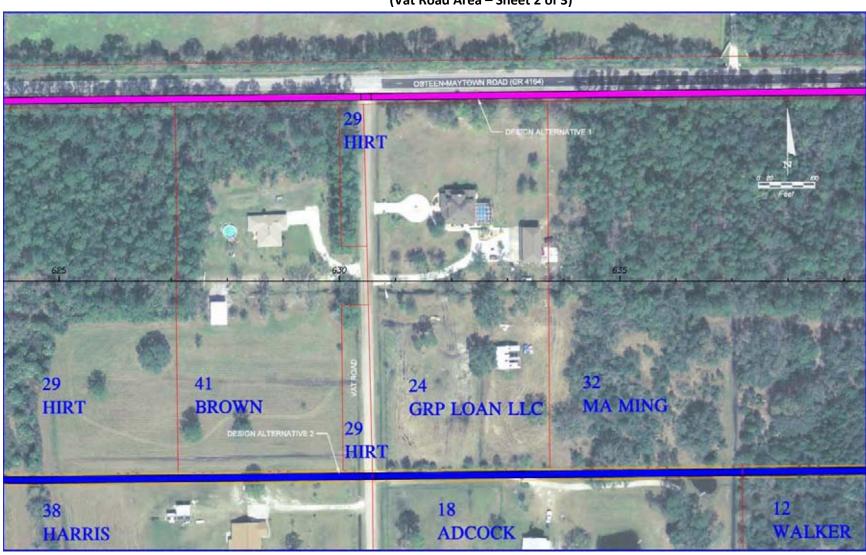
Alternative Alignment Section Sta 624 to Sta 639 (Vat Road Area – Sheet 2 of 3)
